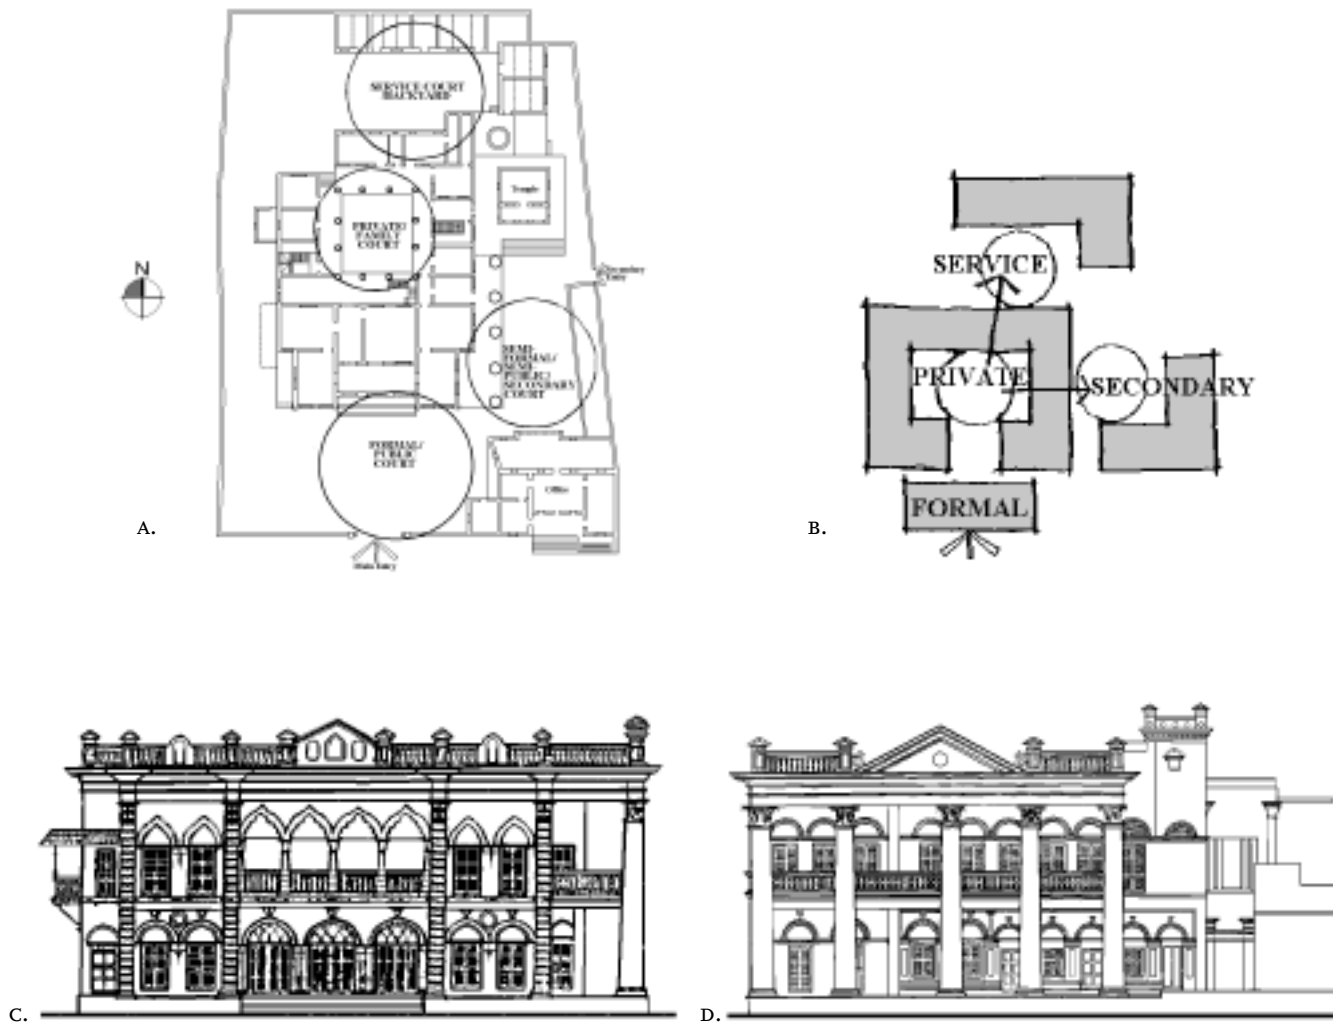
A) ground floor plan. B) articulation of zones. C) south elevation. D) east elevation.
